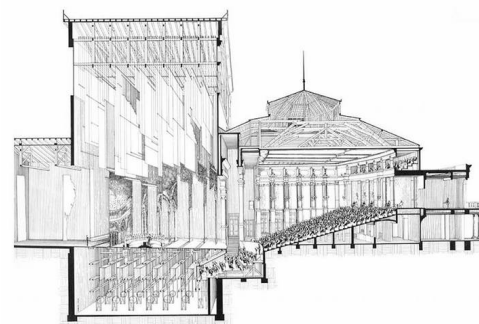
Perspectival Section, Bayreuth Festspielhaus, showing seating, stage, and sunken covered orchestra pit.
